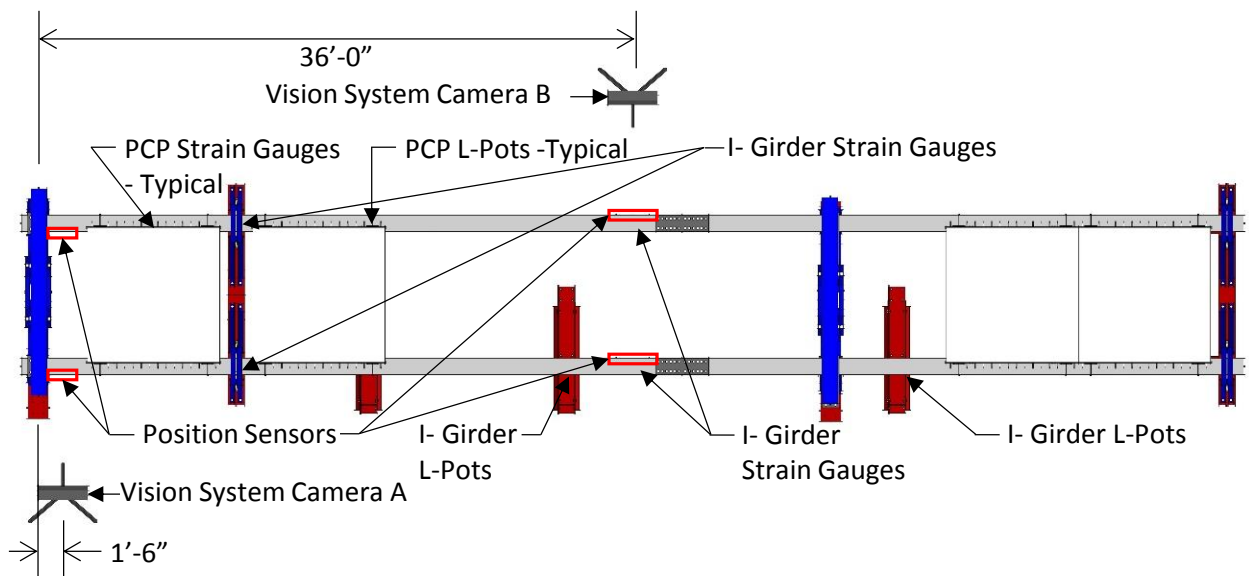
Instrumentation Plan for Overhang System – Plan View
